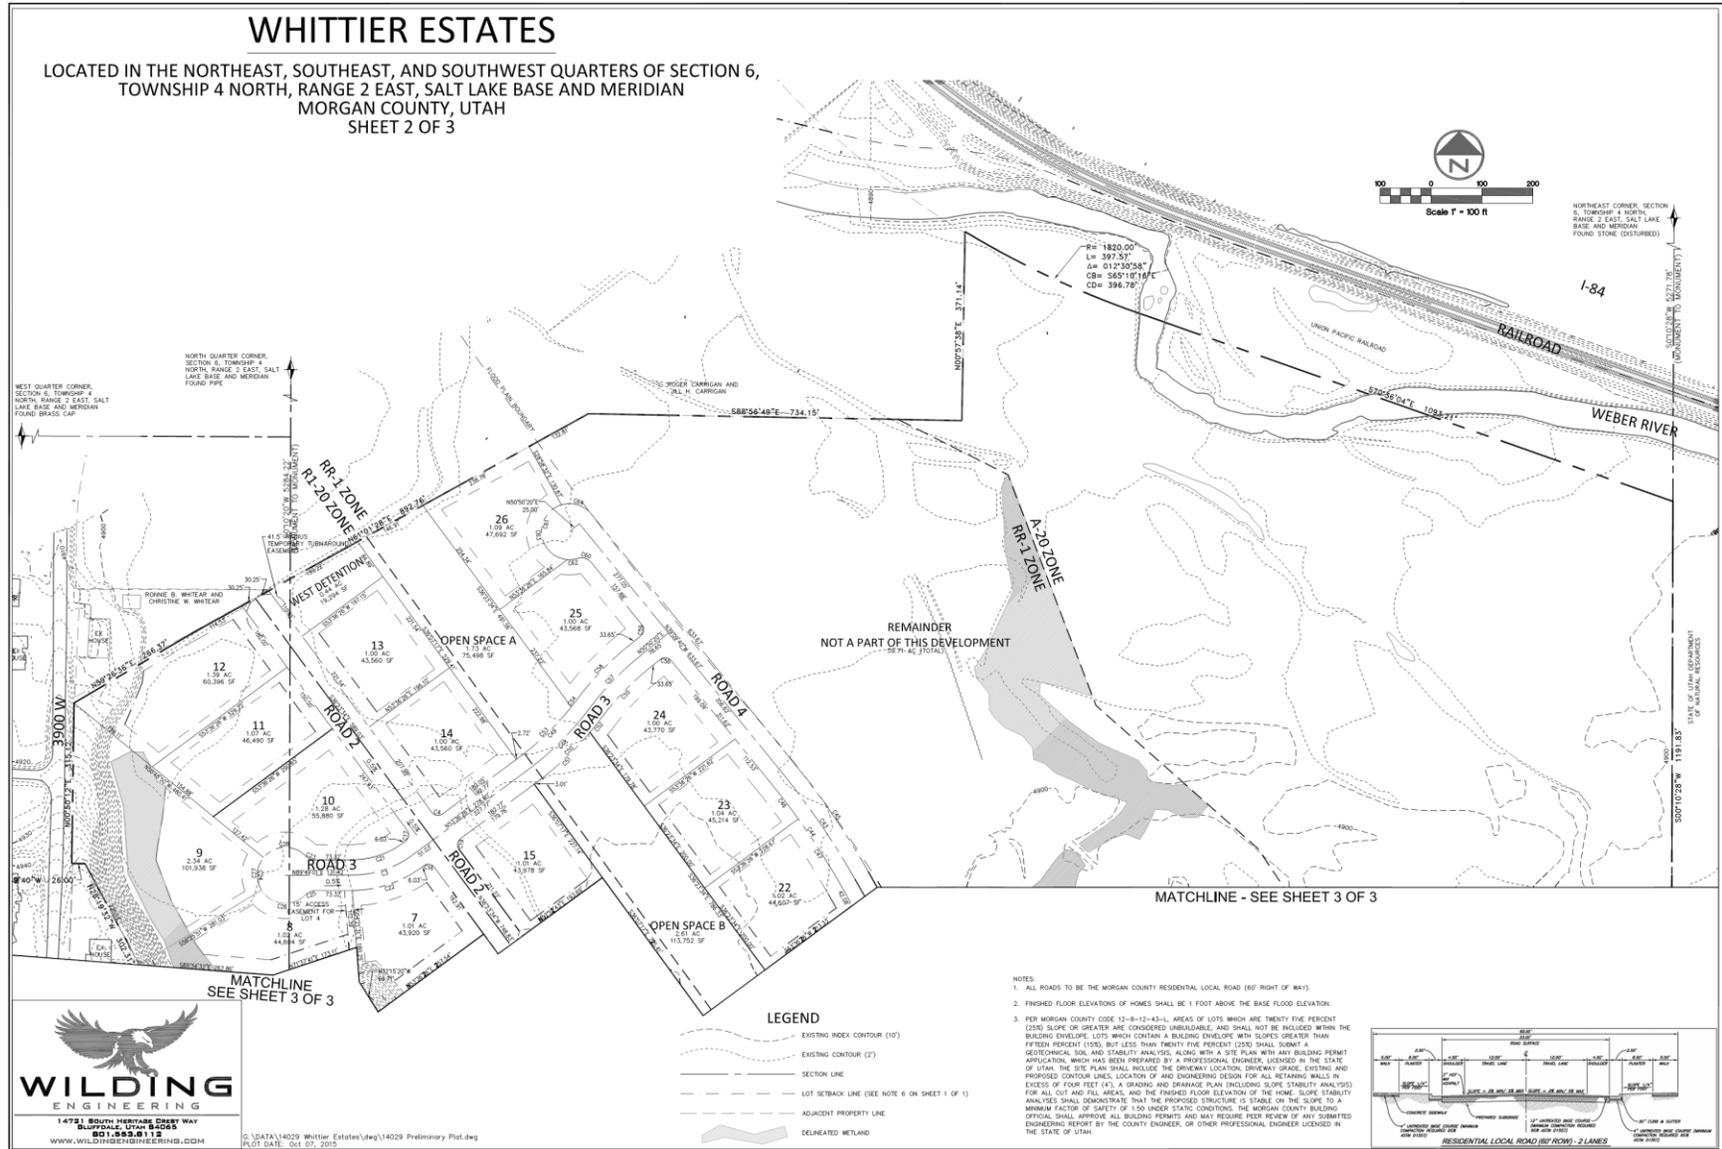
Exhibit F: Proposed Subdivision Preliminary Plat (Page 2)
